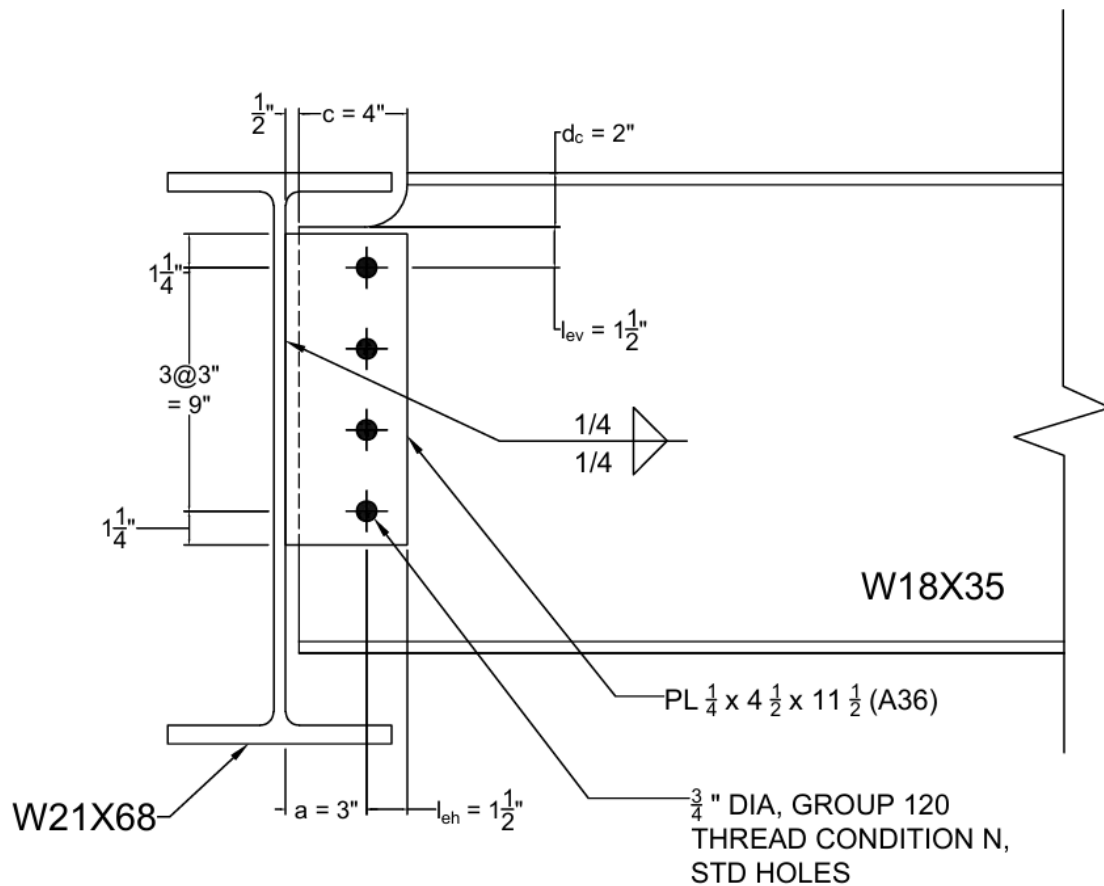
Beam to Girder Design (B1 to G1 on third floor)
